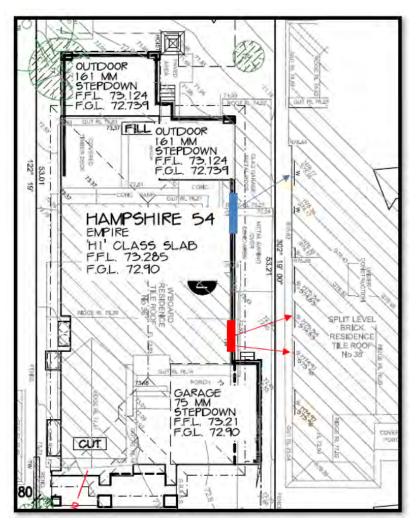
Proposed site plan and sitting room window (red) and family room window (blue) in relation to adjoining windows at No. 38 Olive Street.
